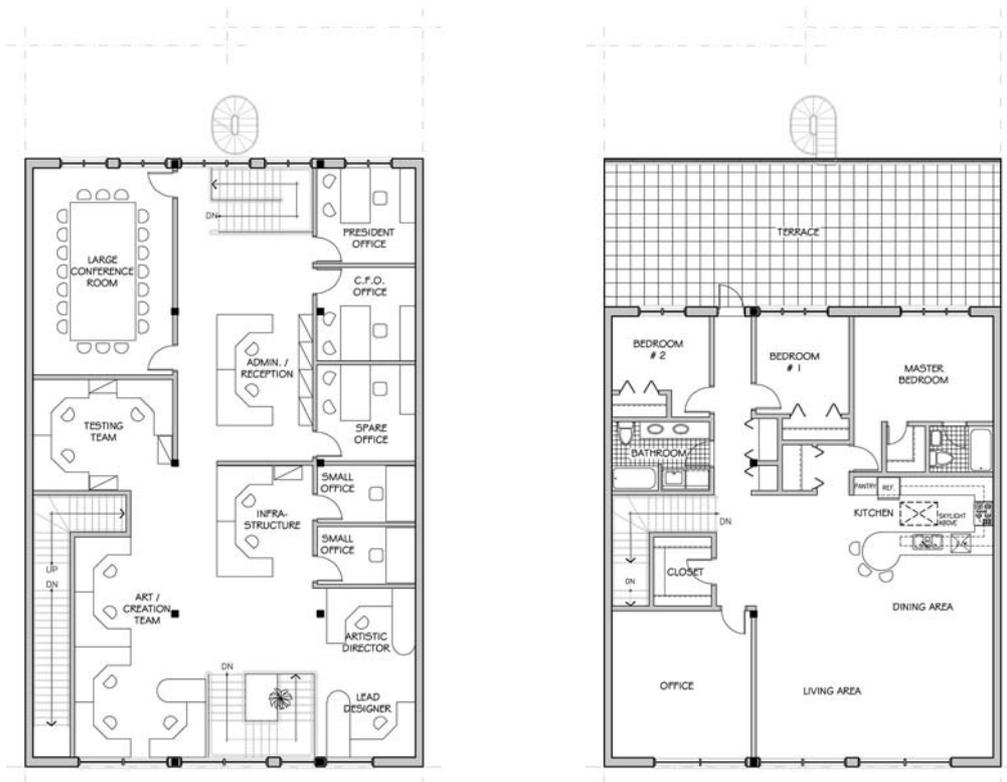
Floor plans of the second floor and top floor of the design project prepared by the Building Pros team.
